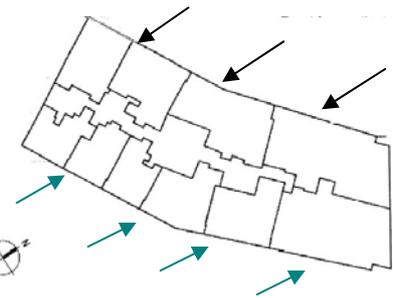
Building layout showing the window openings of all dwelling units facing the north and south direction except dwelling unit 02. Dwelling 02 has window openings facing only the south direction and hence it is not considered meeting the requirement 1-2(a) Option 2(i)
